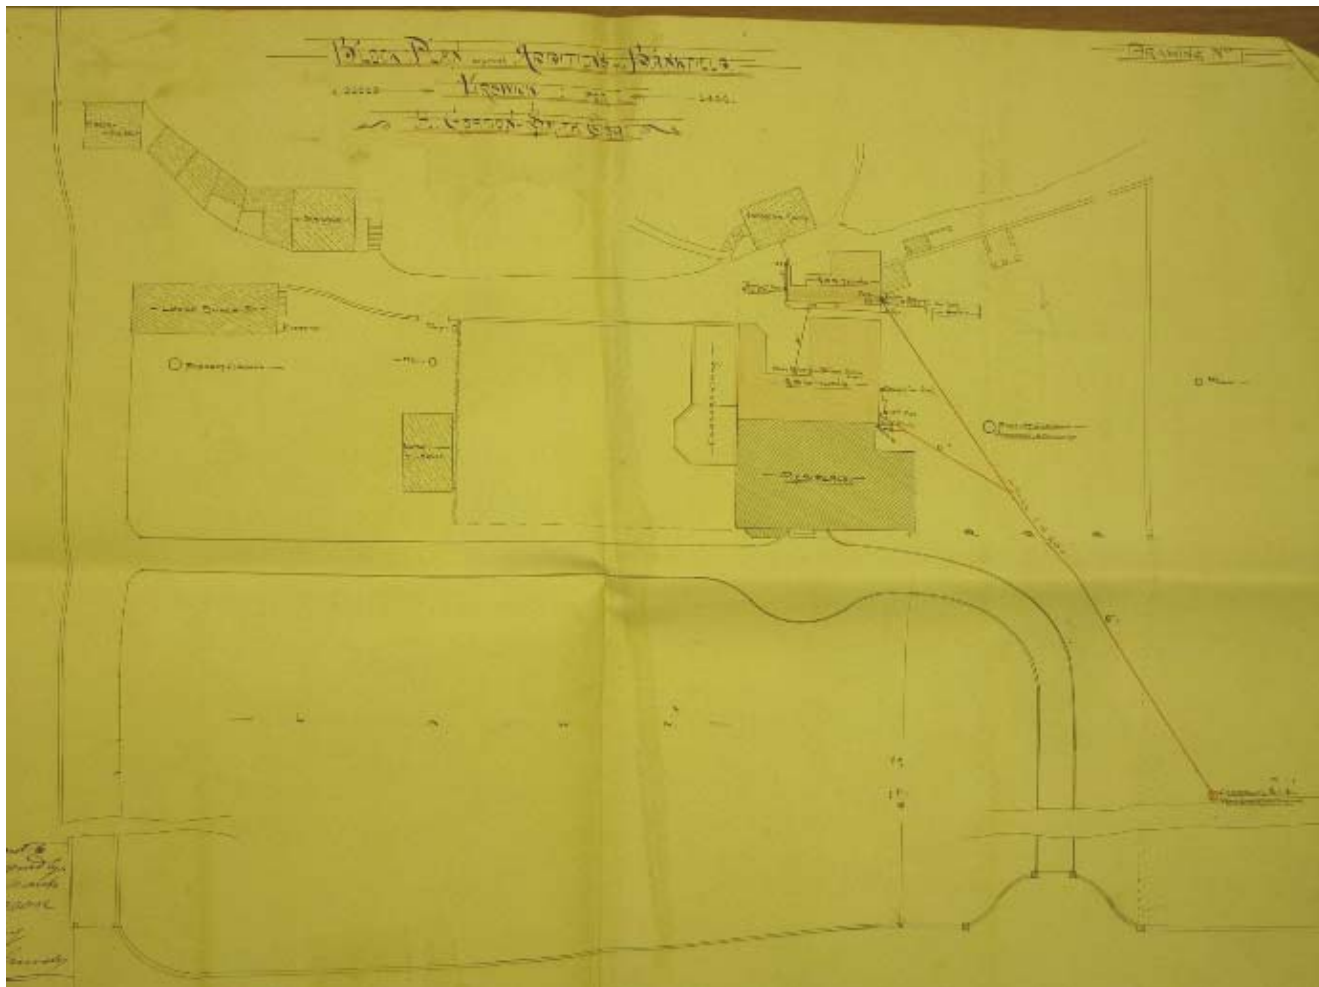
Plan showing the arrangement of buildings around Bankfield Hall in 1886 (CRO(B) Z1231 1886)
